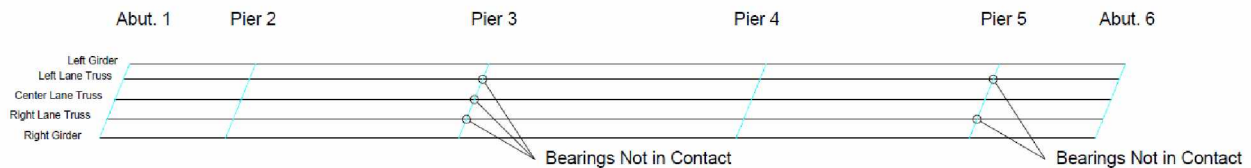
Plan View: Bearings that are Not Contact with Masonry Plates
